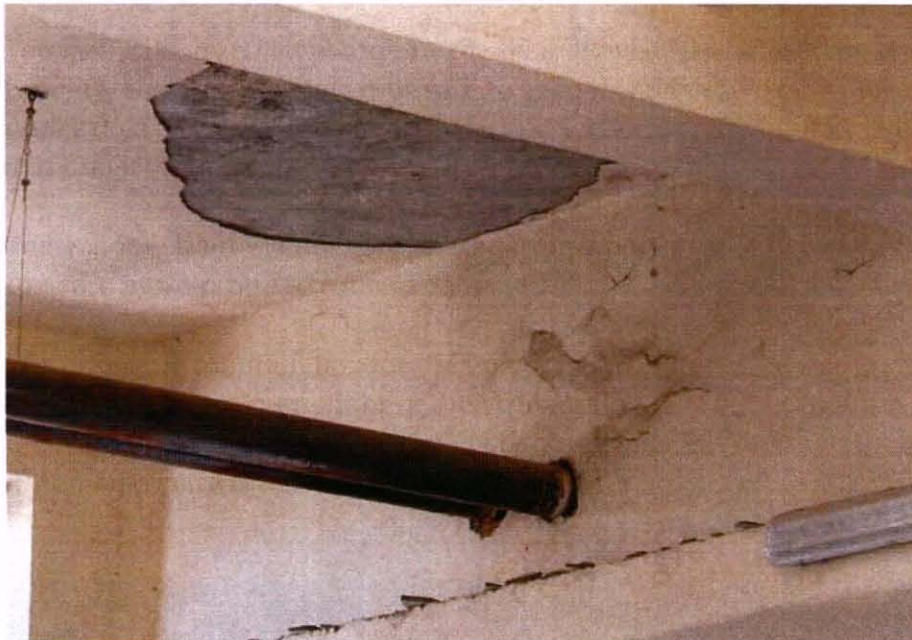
Power Plant 1. A view of the ceiling area in the rear left corner of Power Plant 1 that shows extensive cracking and deterioration of the plaster work less than 1 year after the building was renovated. (Photo—SIGAR)
